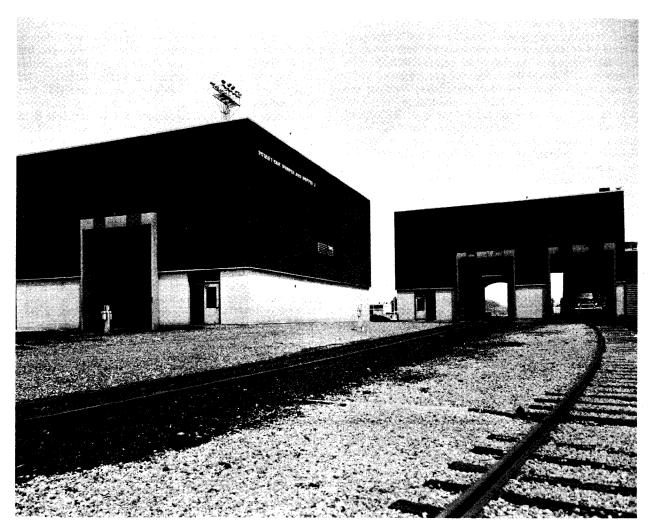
Hopper buildings No. 1, at right, and No. 2 each house a rotary car dumper. Hopper building No. 1 also provides through-rail tracks and accommodations for coal dump trucks.
